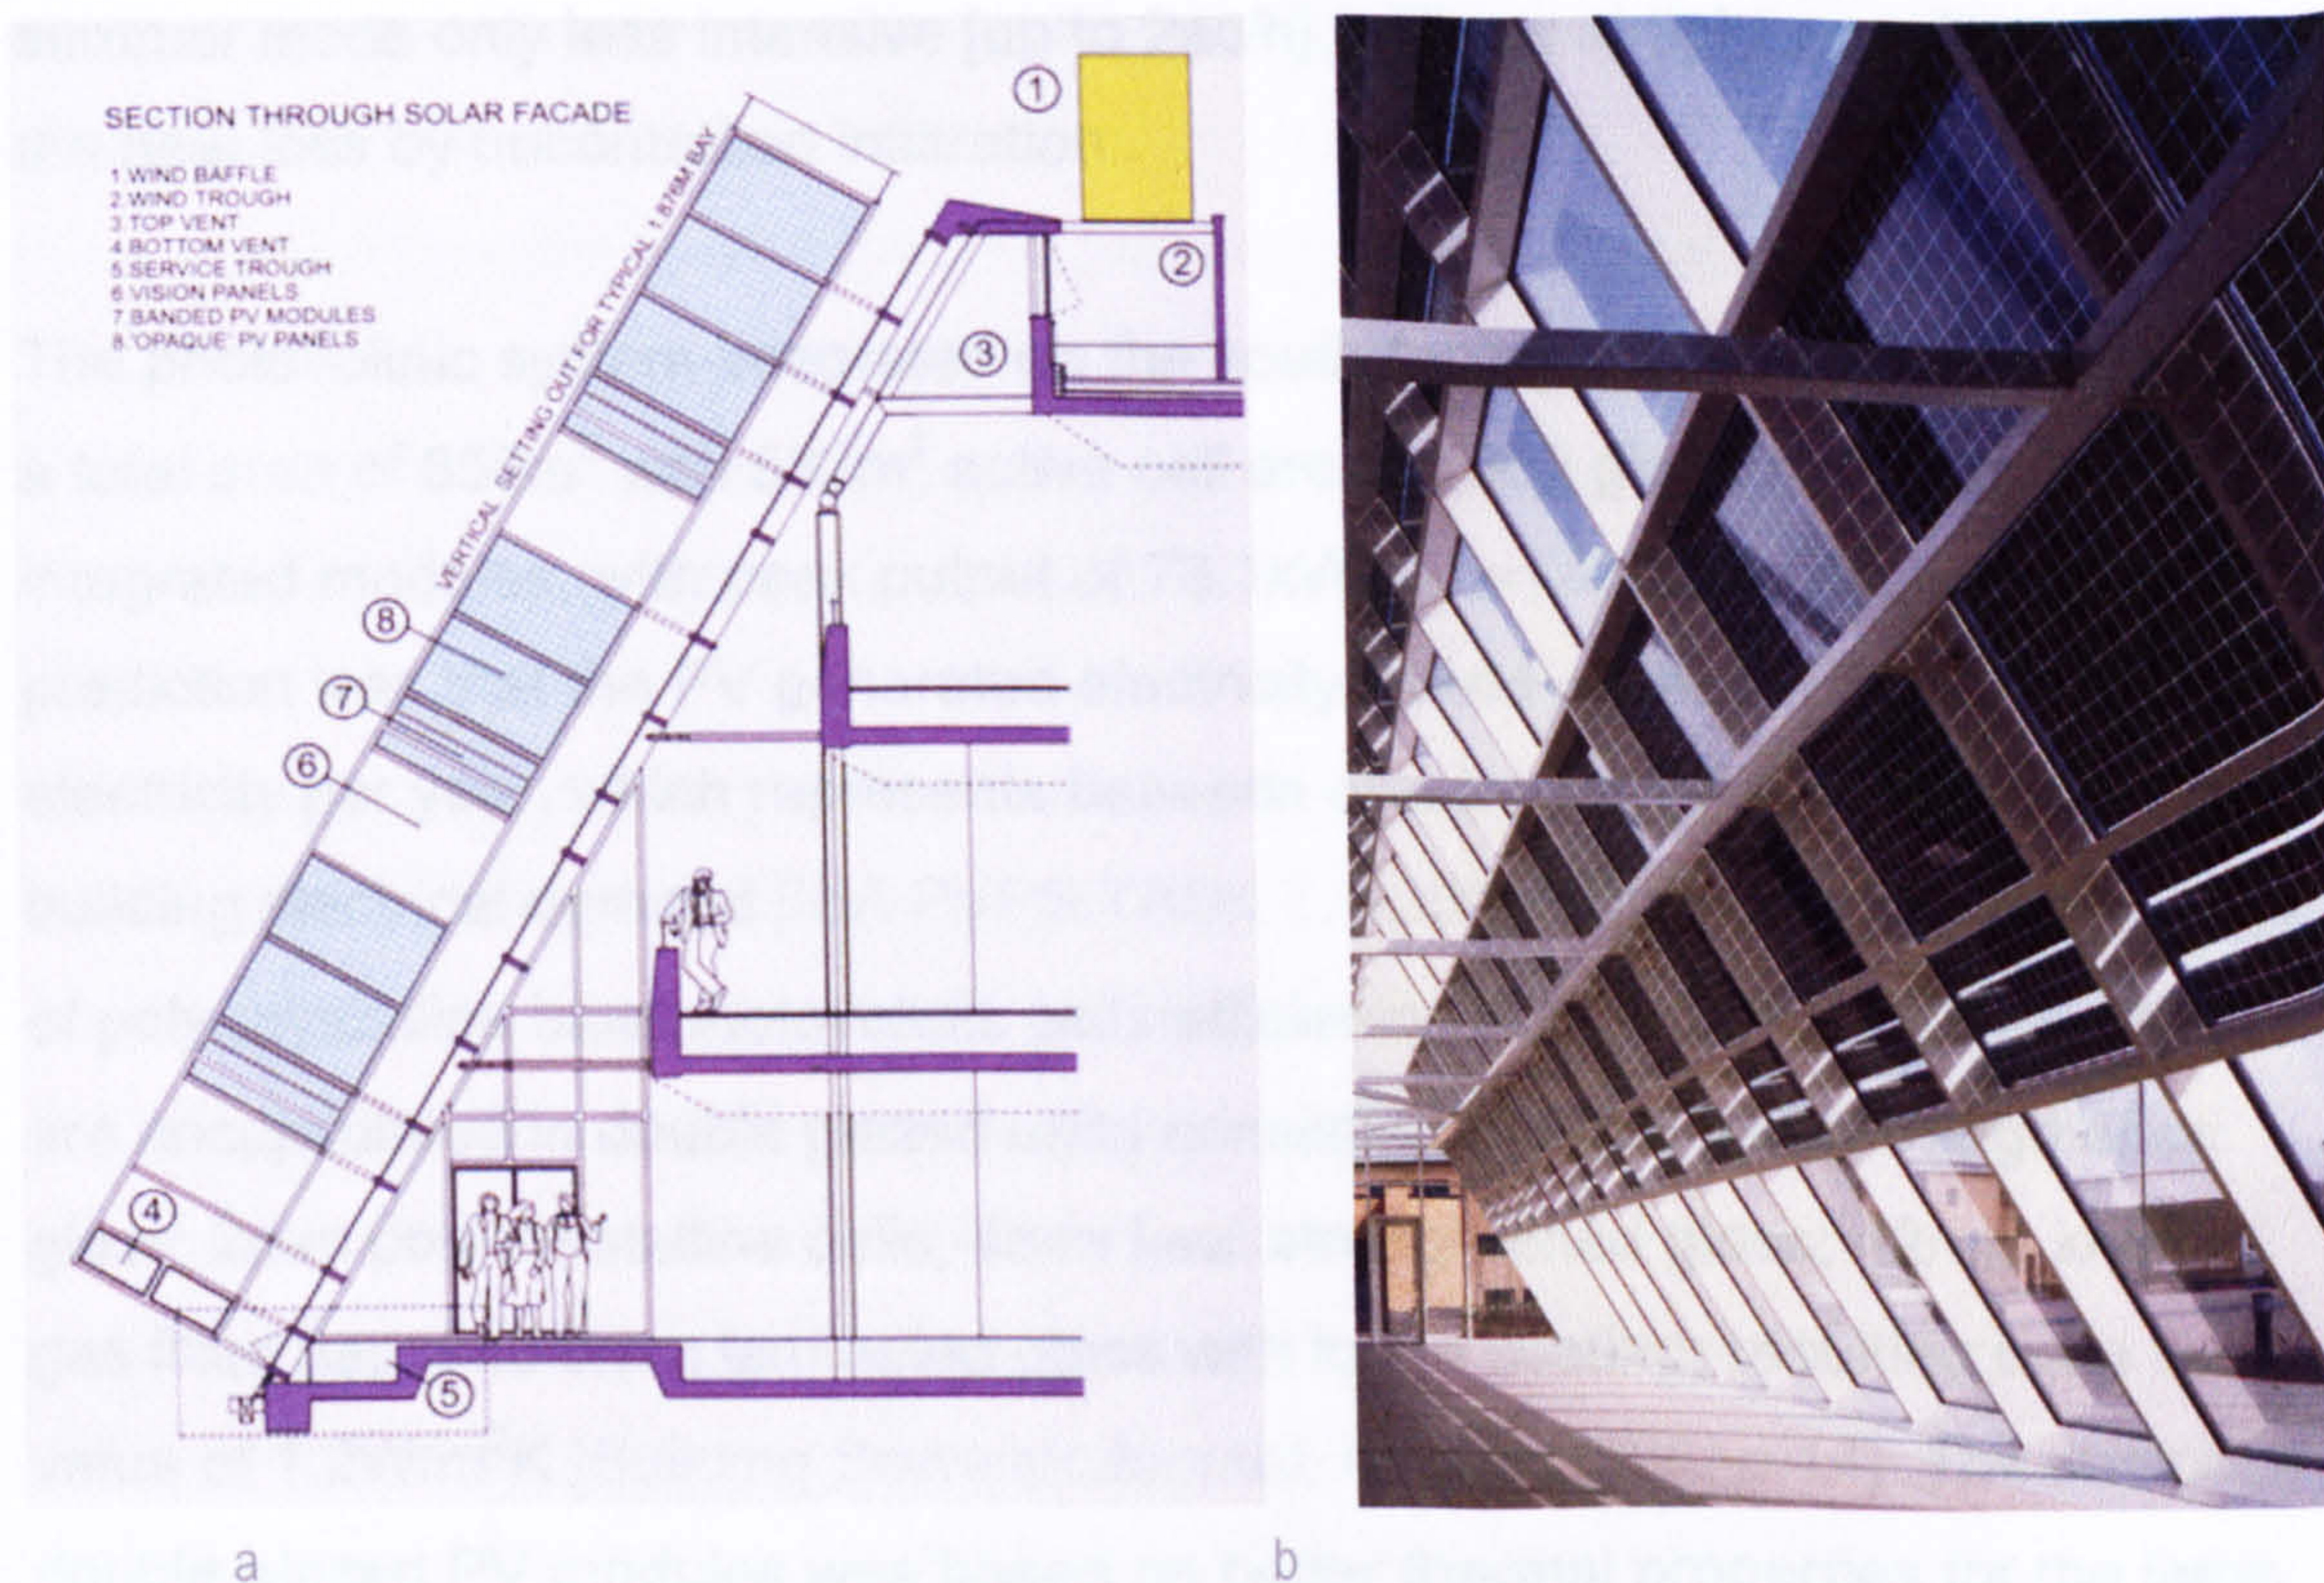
[a-b] Doxford Solar Office, Sunderland, UK. South façade section and interior view
